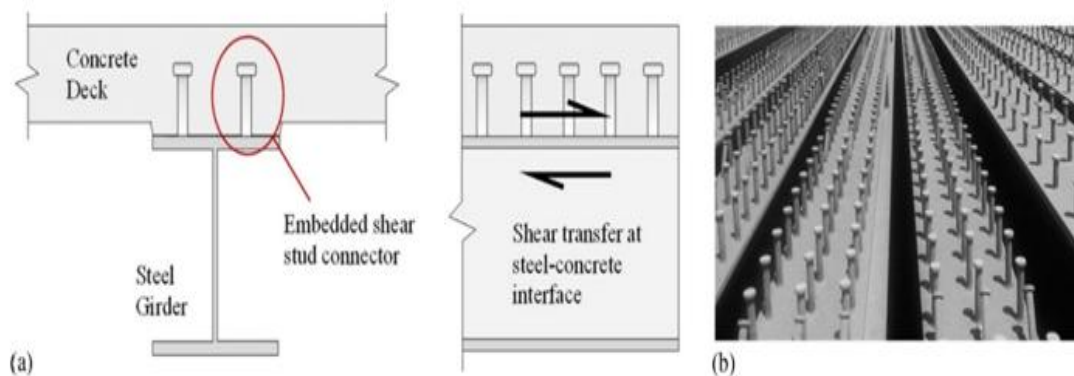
(a) Mechanism of shear studs for load transfer at the steel-concrete interface; (b) shear studs embedded on plate girder.
